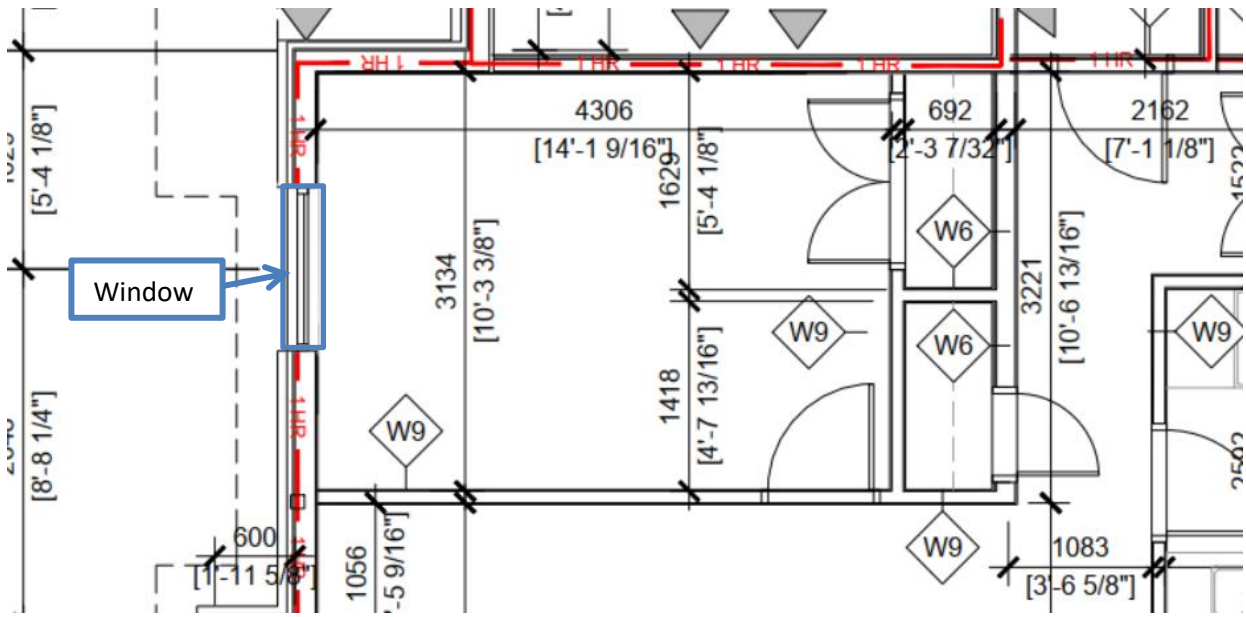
Layout of bedroom in south west 1st floor unit used for analysis of POR1. Exterior wall assembly equivalent to CMHC wall type EW5 and EW2.
